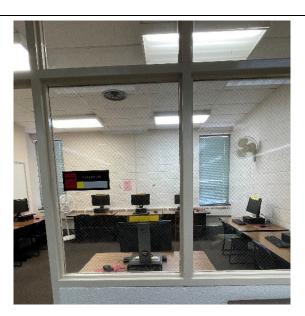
View of beige LBP on metal door and window frames associated with room 202.
